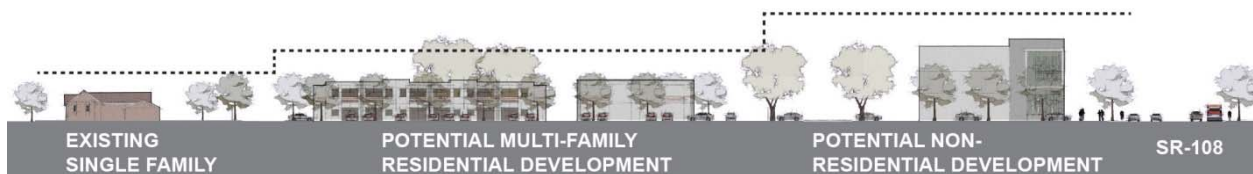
Buildings shown gradually stepping down to complement existing neighborhood.
